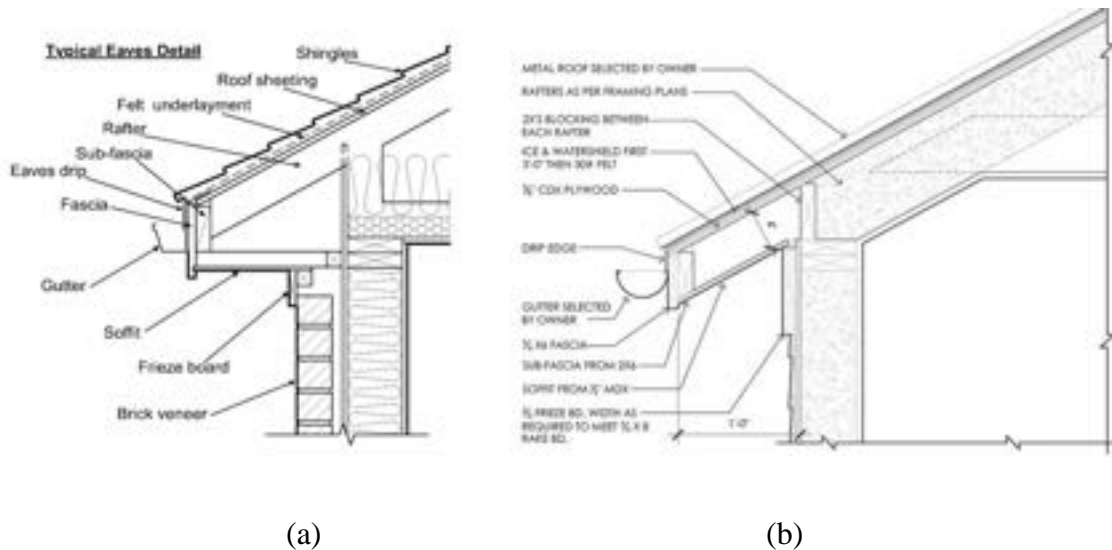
1: Typical details for (a) closed overhang (b) open overhang
